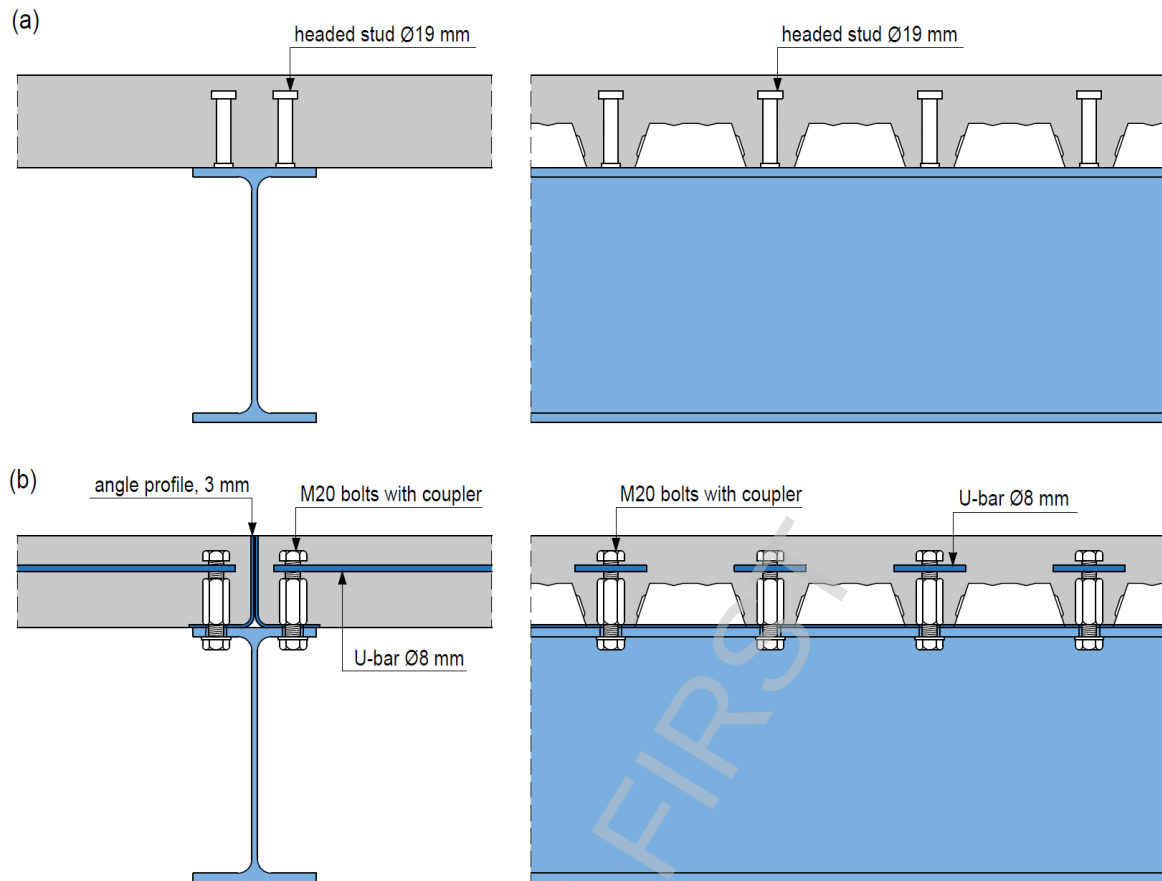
Shear connection: (a) non-demountable, (b) demountable
